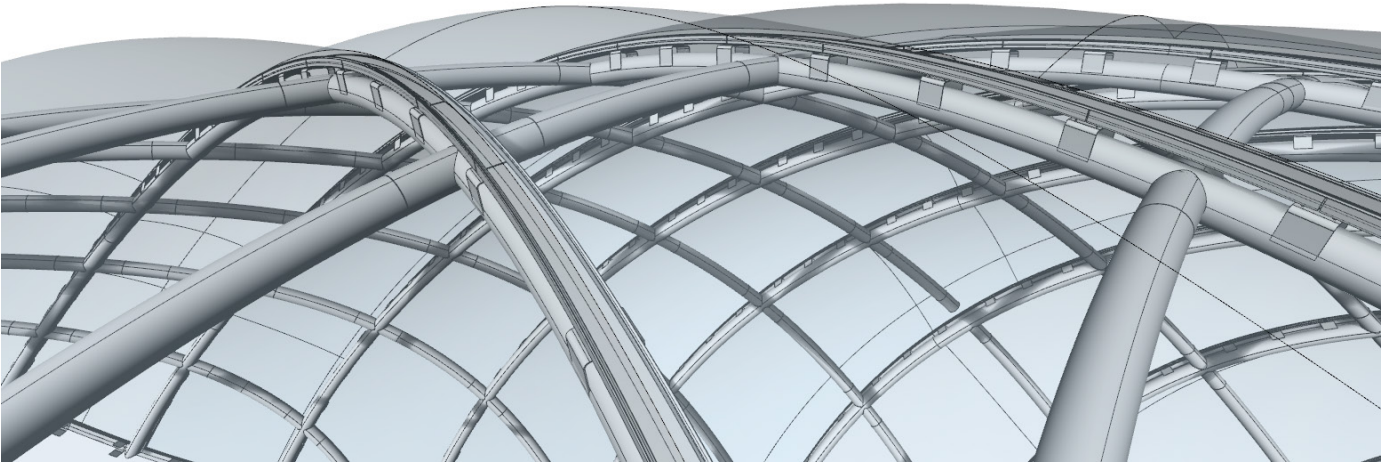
Pavillon de Léau Close-up of Detailed Canopy Skin
